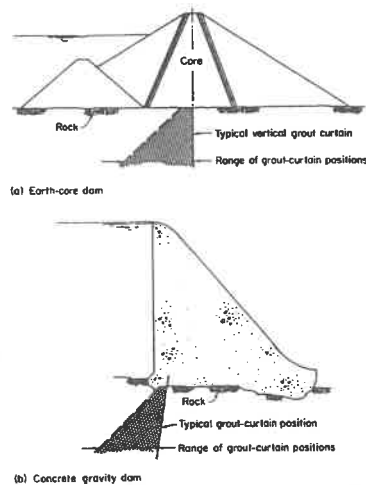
Application of grouting in dam rehabilitation and construction (a) Grout curtain under earth dam (b) Grout curtain under concrete dam (after Kosmatka, 1990)
